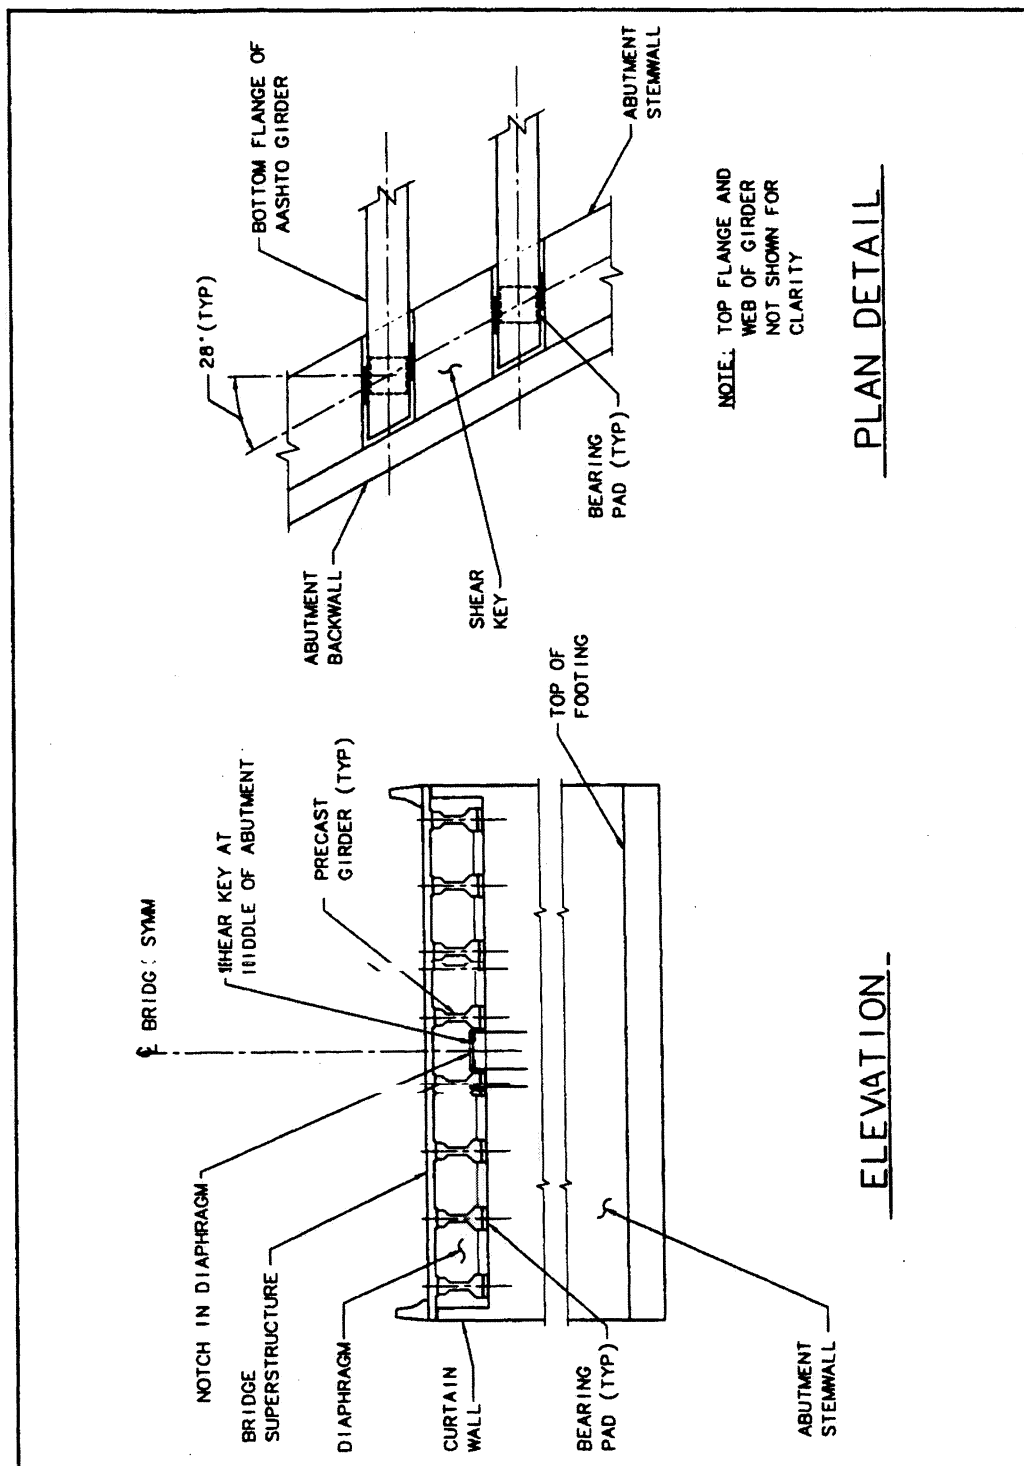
Bridge No. 3 - Abutment Elevation and Detail
